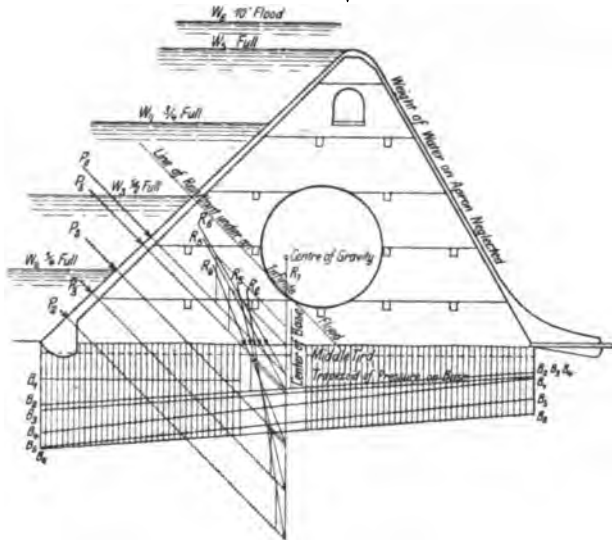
Behavior of Resultants in a Concrete-Steel Dam
